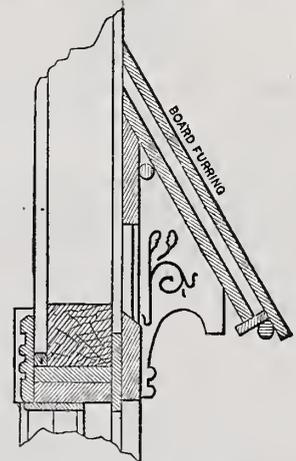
Section through Hood over Windows.—Scale, 1/2 Inch to the Foot.
